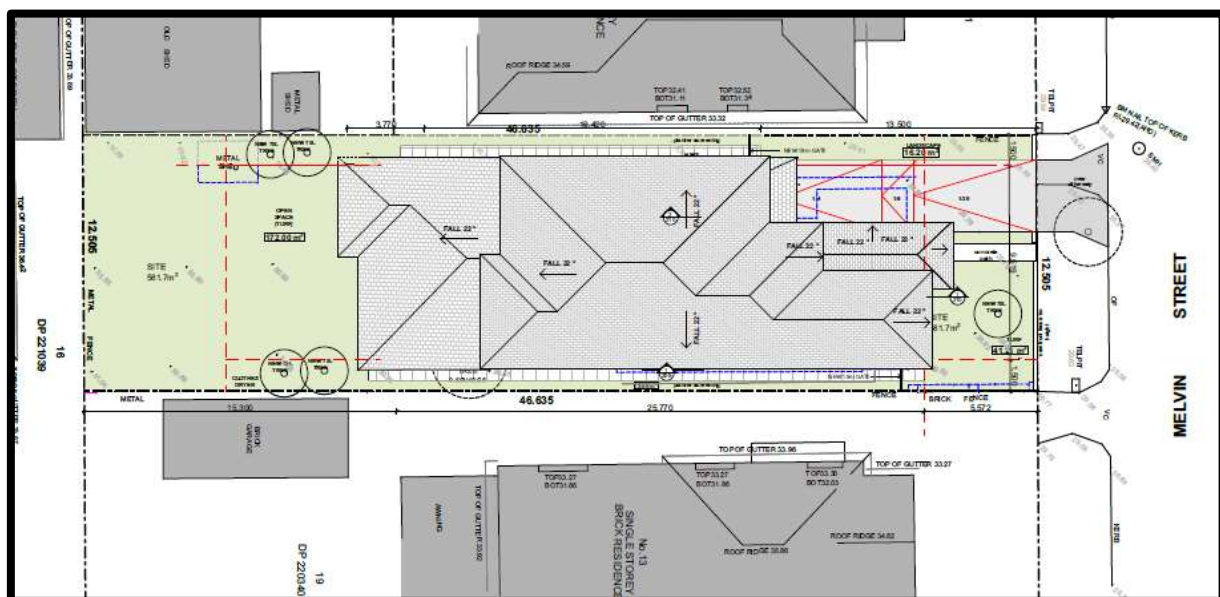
Proposed site plan – 15 Melvin Street Beverly Hills (Source: Nuovo Design Studio Pty Ltd 2020)
